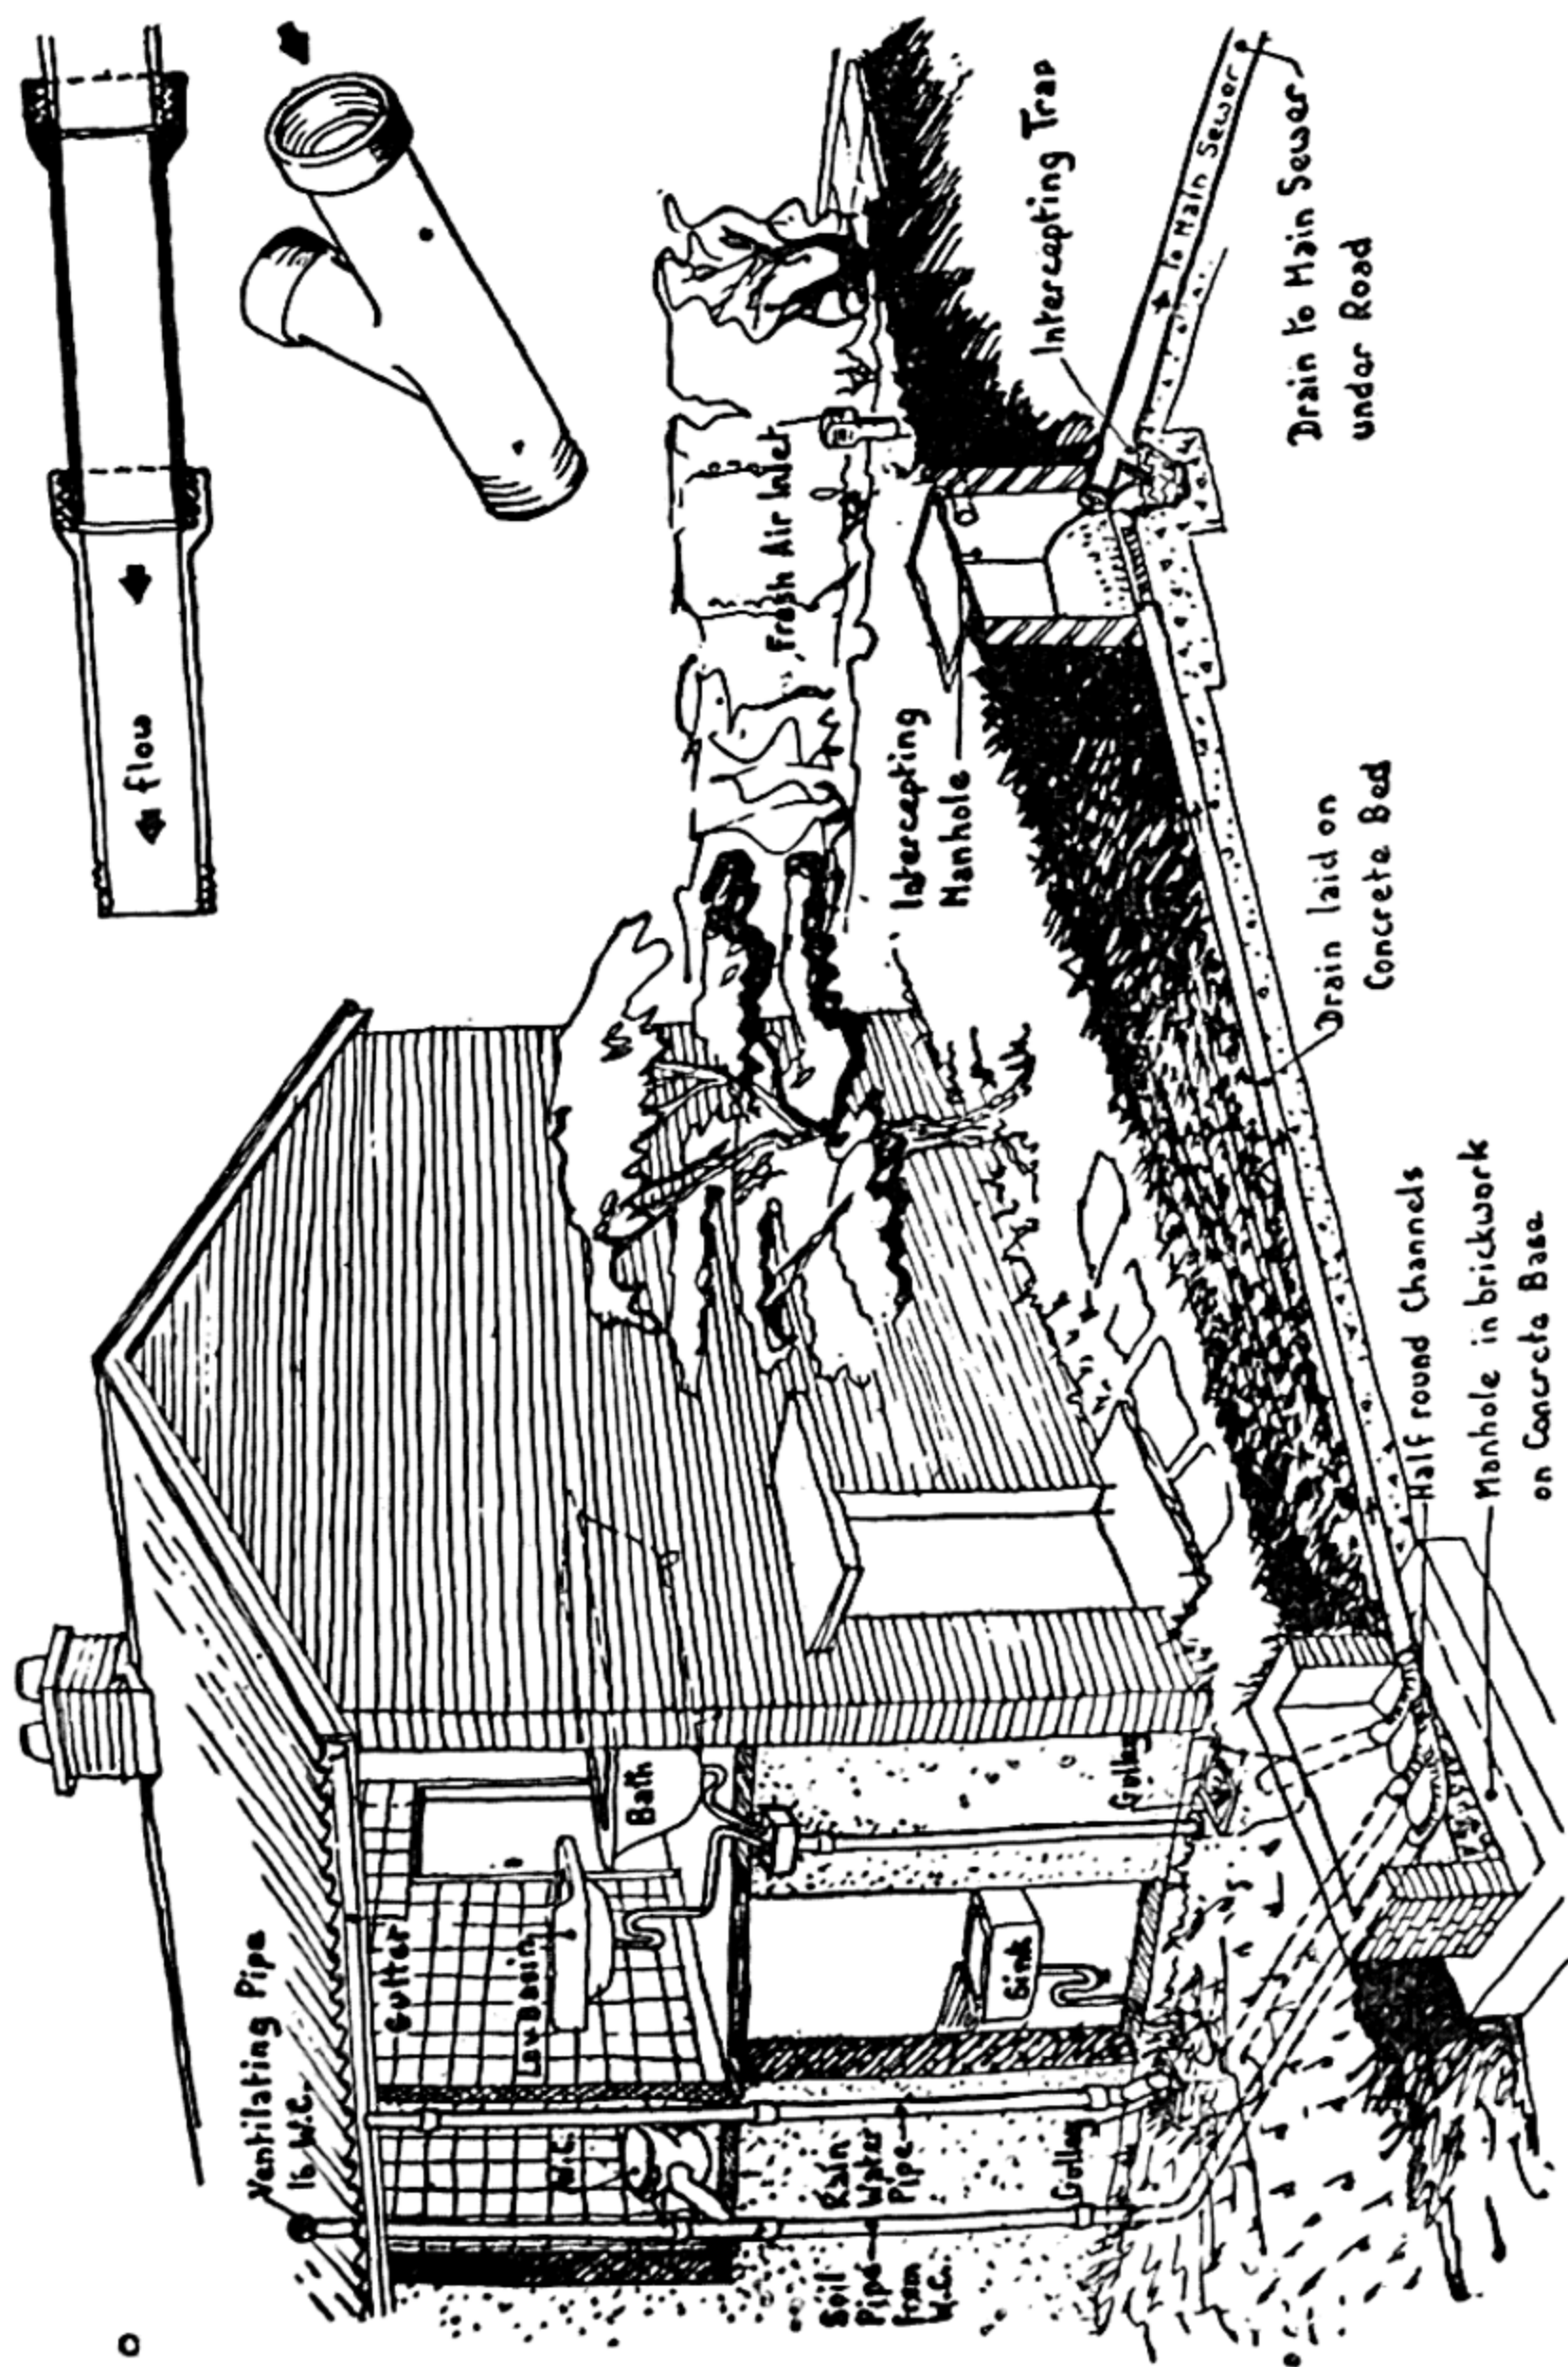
HOW THE HOUSE DRAINS CONNECT WITH THE SEWERS. Showing manholes and trap, and *top right*: How drain pipes are laid.
